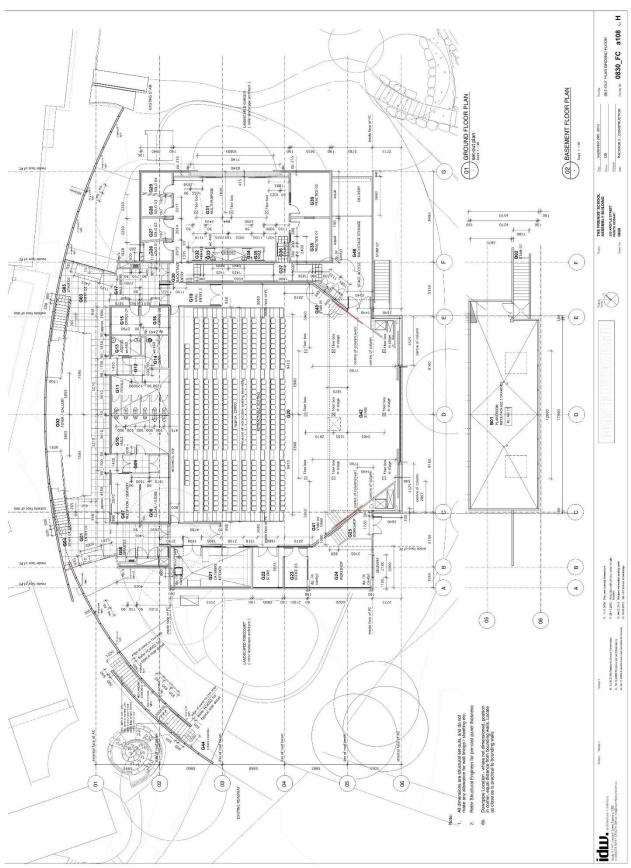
The Farrall Centre – Set-out Plan Ground Floor
